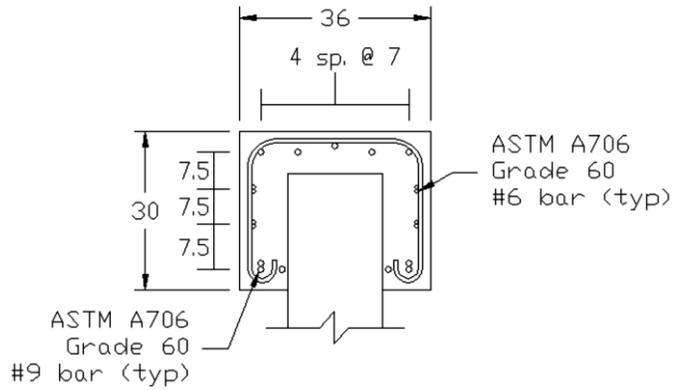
Footing Pocket Connections (Kavianipour and Saiidi, 2013)
